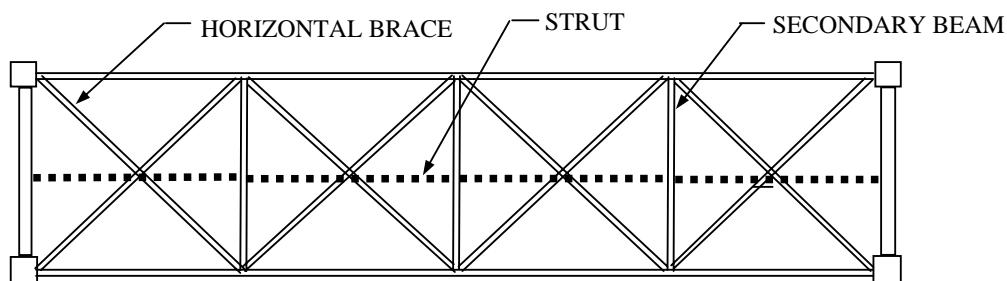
Typical Pattern of Horizontal Brace & Strut
